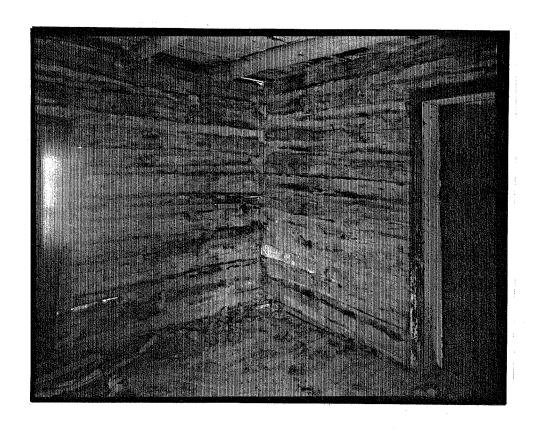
Webb House, first floor: detail of wall construction in northeast corner looking northeast.
